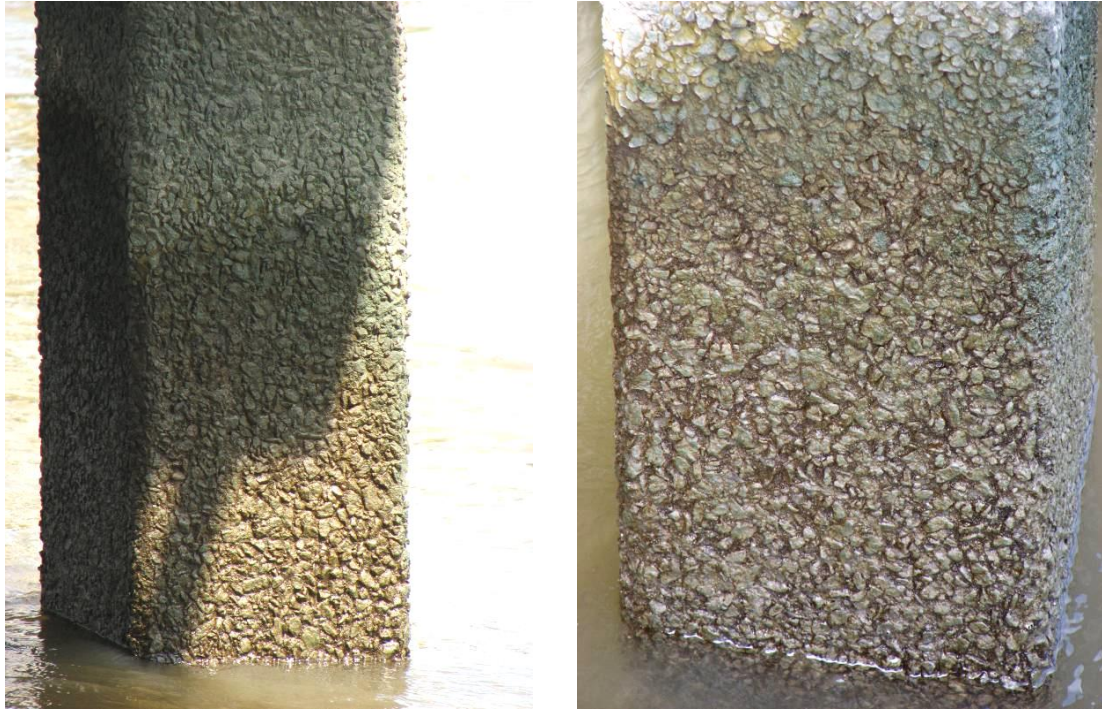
Surface Abrasion Observed in Concrete Substructure of Houlihan Bridge
